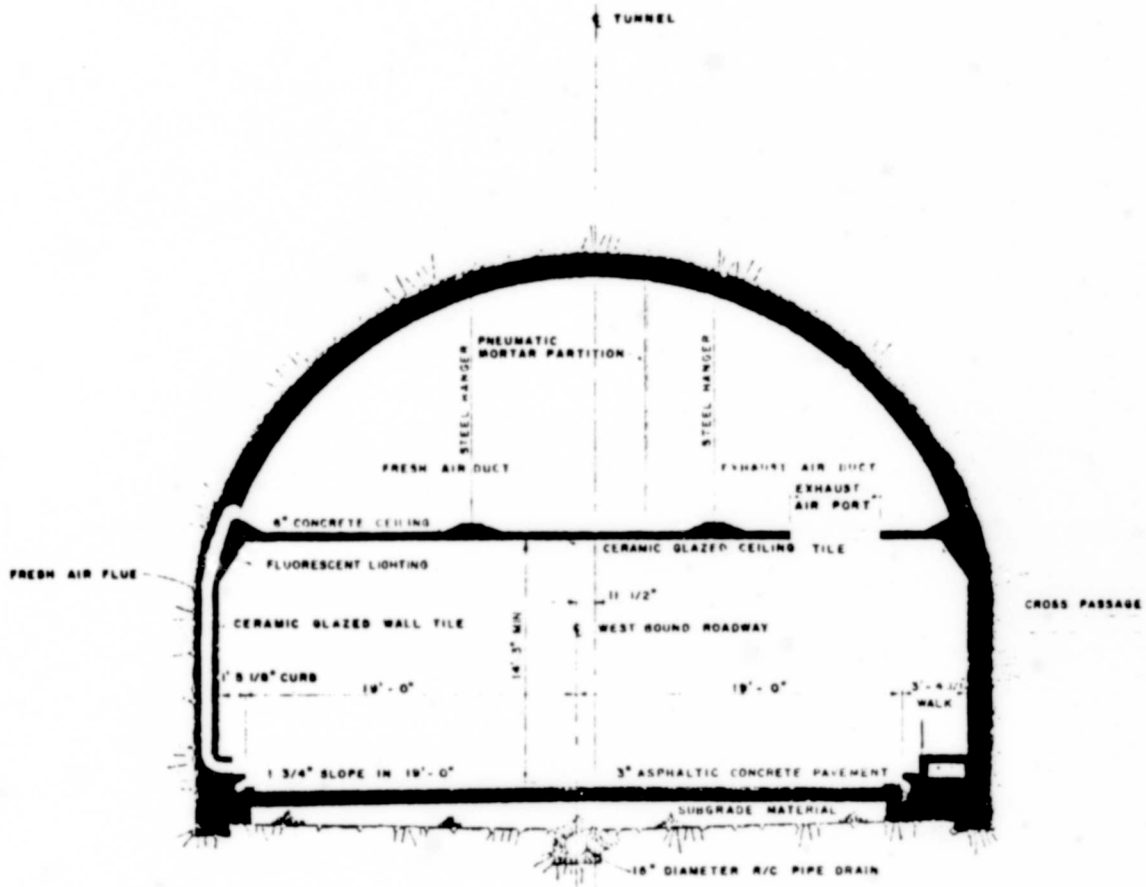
TYPICAL TUNNEL CROSS SECTION
